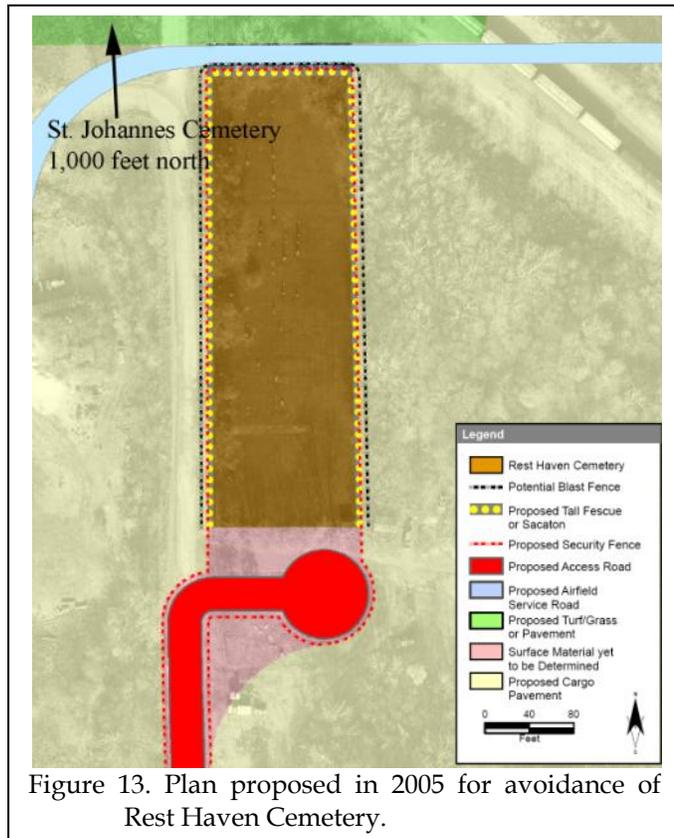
Plan proposed in 2005 for avoidance of Rest Haven Cemetery.
